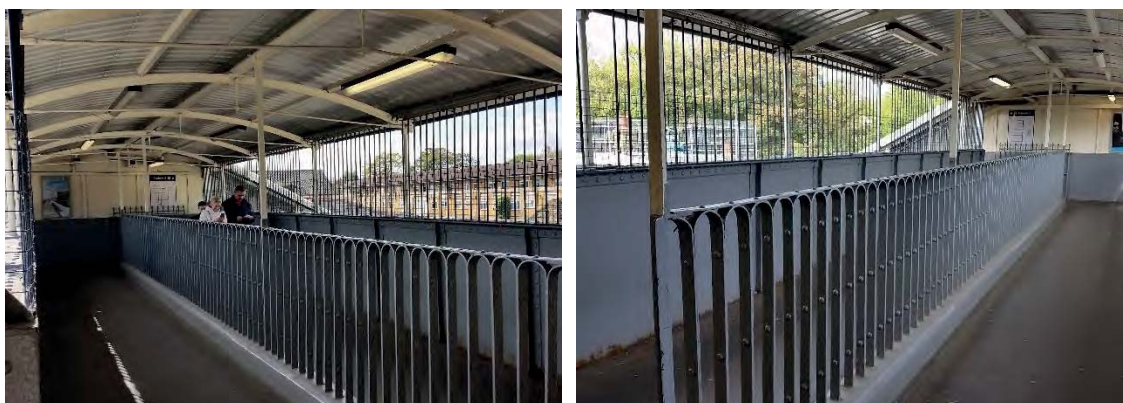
The Footbridge Showing the Railing to Divide it into a Paid Area and Unpaid Area
